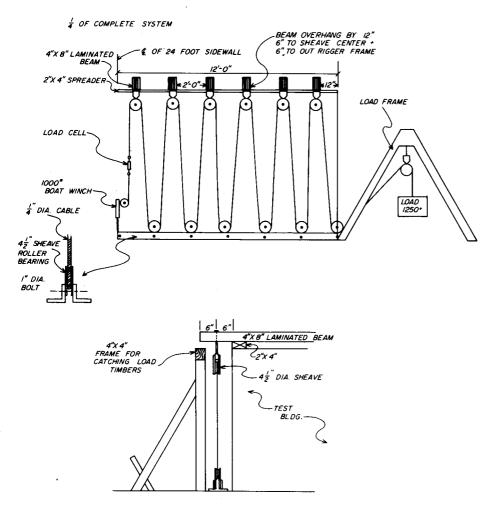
Schematic for applying design load to north and south walls of test structures.
